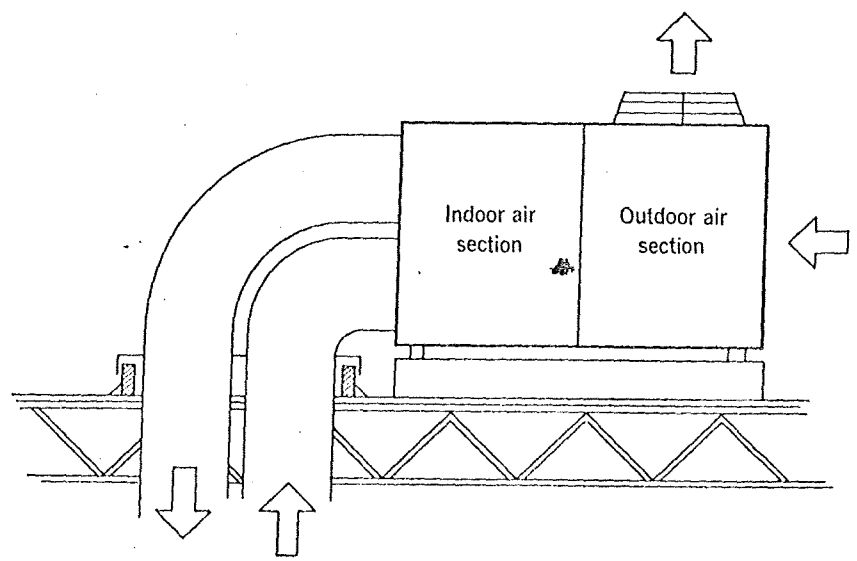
Horizontal cabinet, single package type heat pump mounted on roof.
